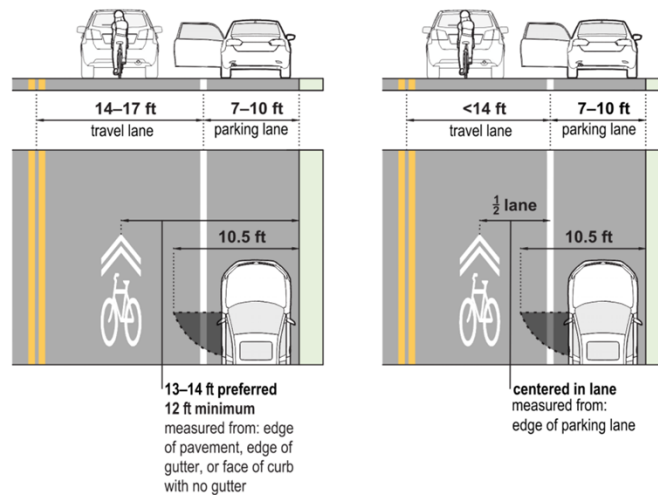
Shared Lane Marking Lateral Placement in Travel Lanes adjacent to a Parking Lane
